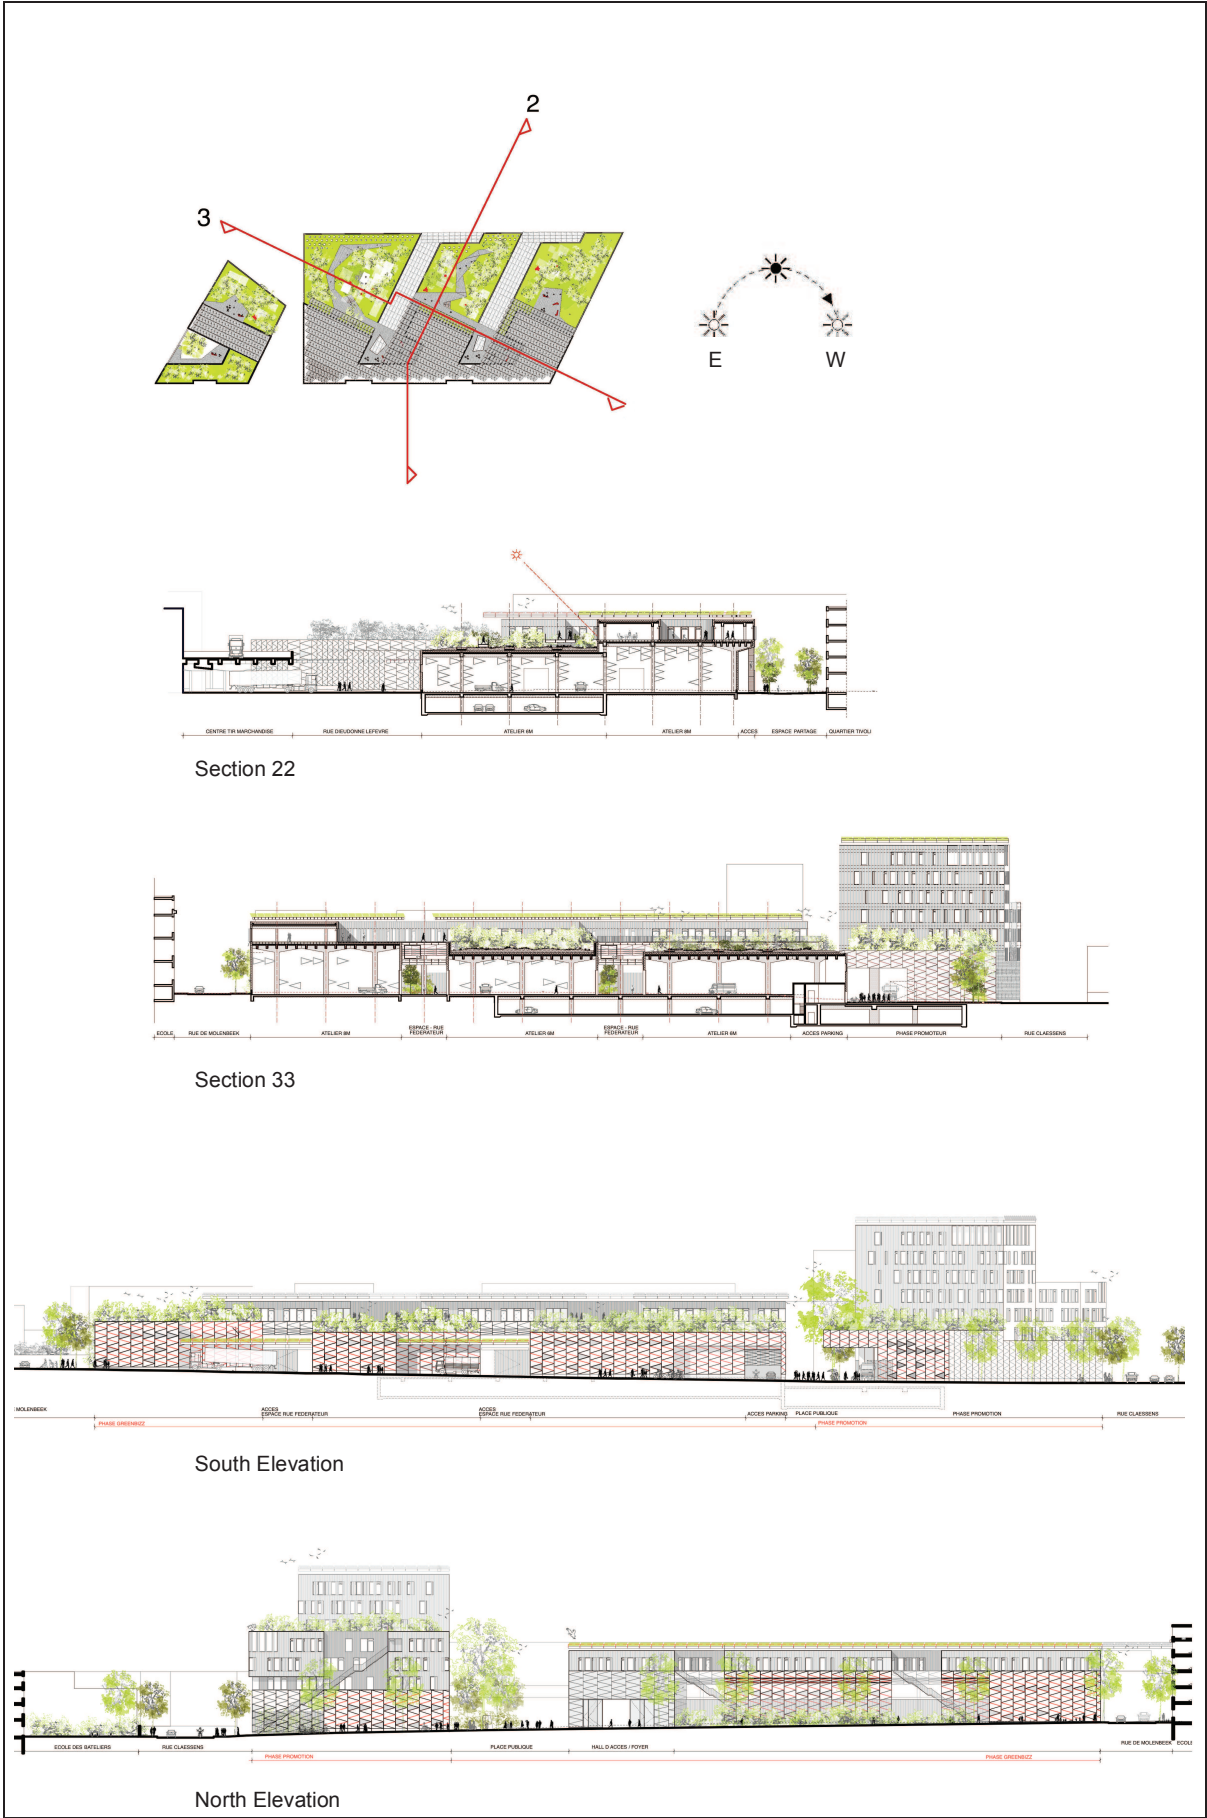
FIG VII: PLANS, SECTIONS & STREET ELEVATIONS
